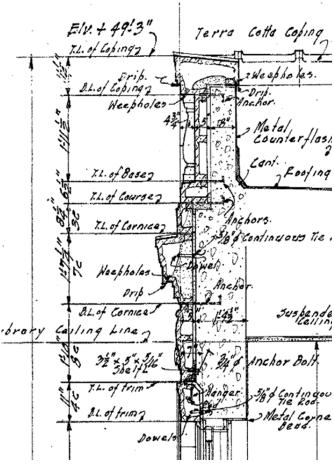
Partial wall section detail from original 1929 drawings, showing terra cotta units and anchoring system at main entrance
